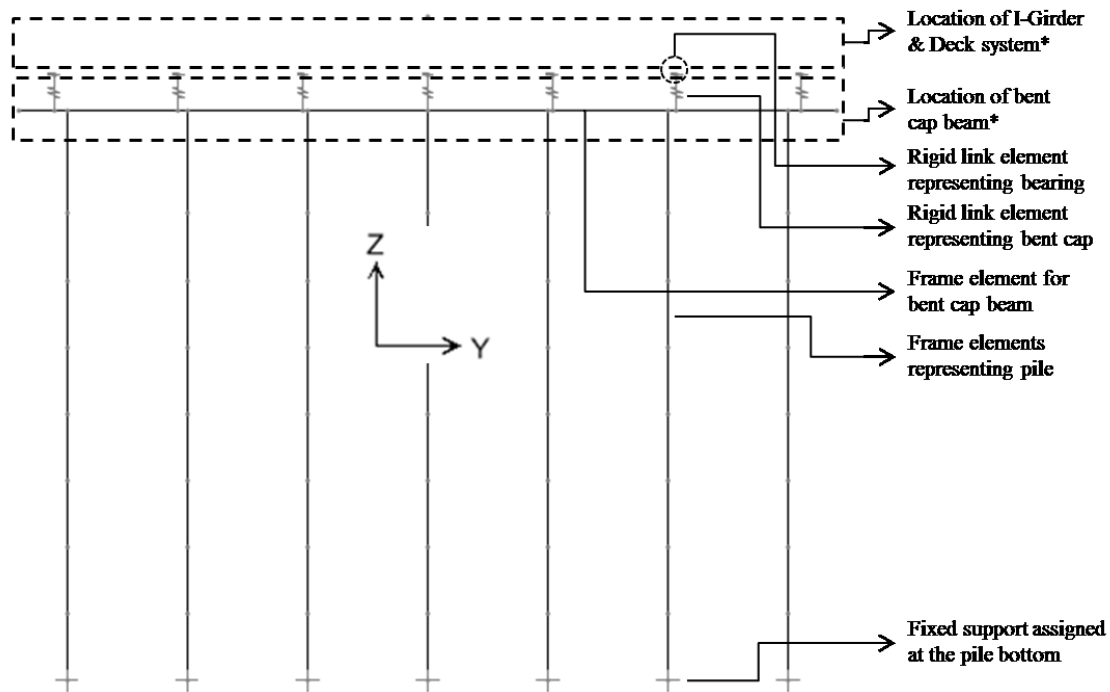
Russell Creek Bridge deck cross-section at an interior bent.
